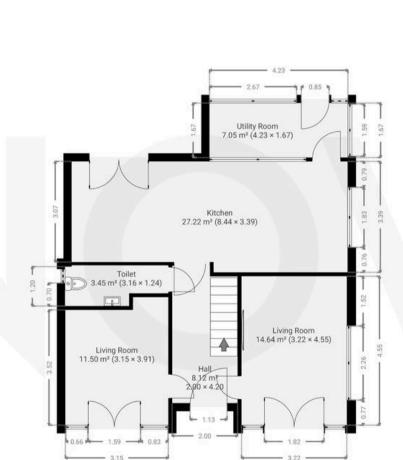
DETAILS Total area: 135.89 m² Living area: 135.89 m² Floors: 2 Rooms: 14
